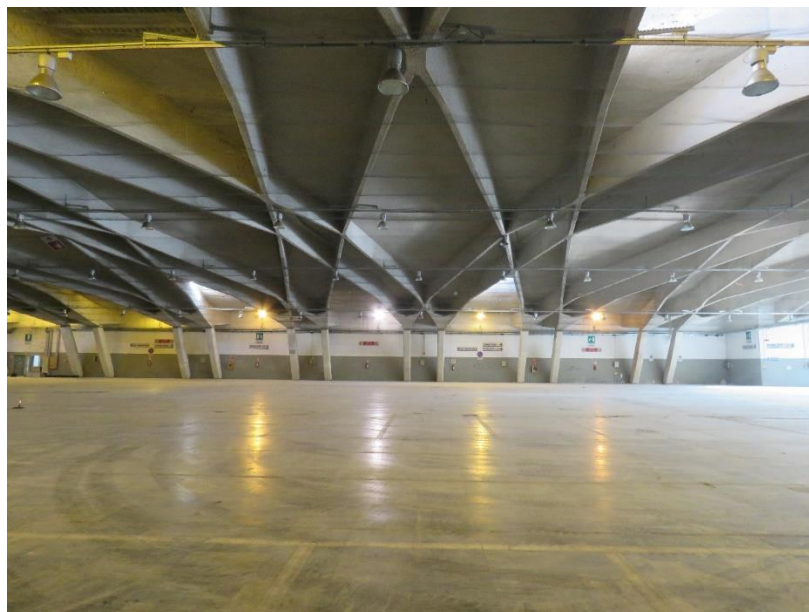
Turin Exhibition Center, underground Pavilion by Riccardo Morandi: internal view with ribs arrangement
